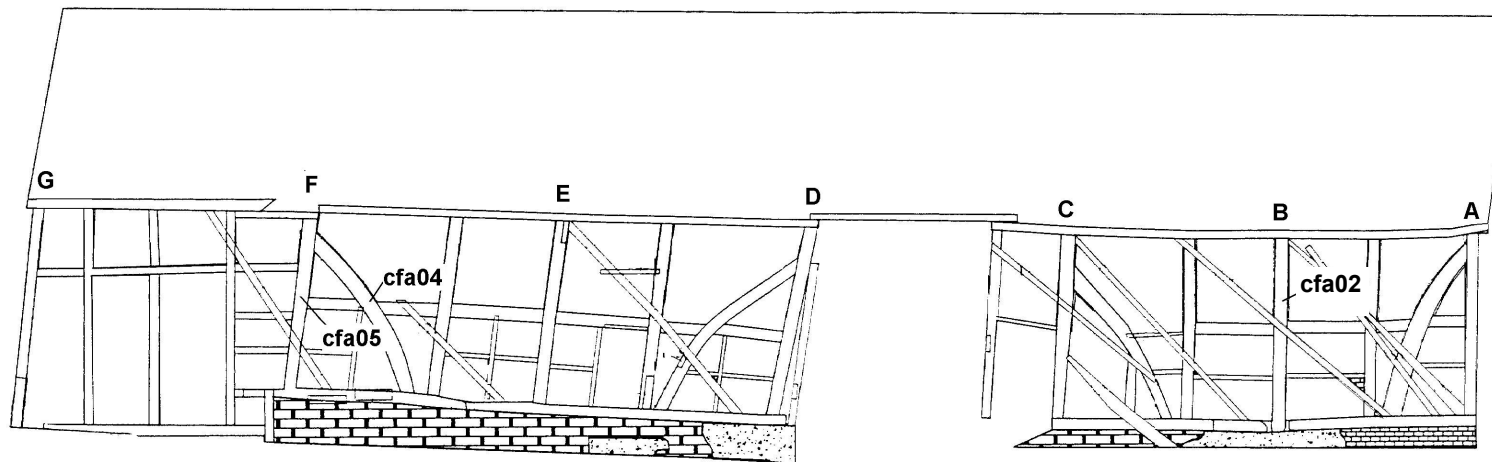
Internal elevation of the east wall showing timbers sampled for dendrochronology
